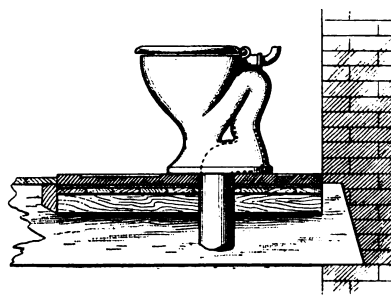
Countersunk Thick Slab Sunk to Floor Level.
